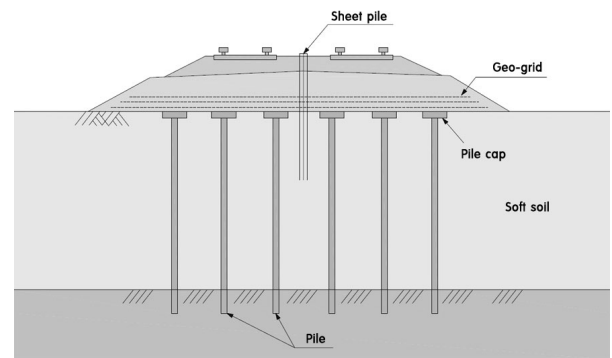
Double track railway between Magdeburge and Berlin by Pile Supported Embankment(Alexiew and Gartung, 1999)
